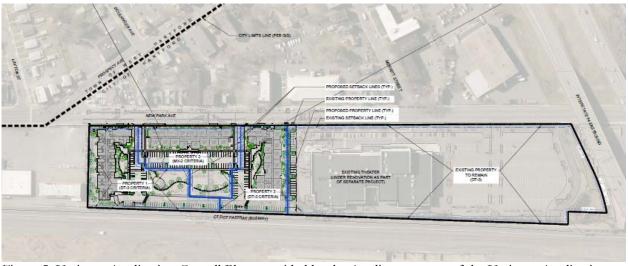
Variance Application Overall Plan, provided by the Applicant as part of the Variance Application plan set, Attachment 4 of this report. Depicts full proposed lot division and proposed improvements.
